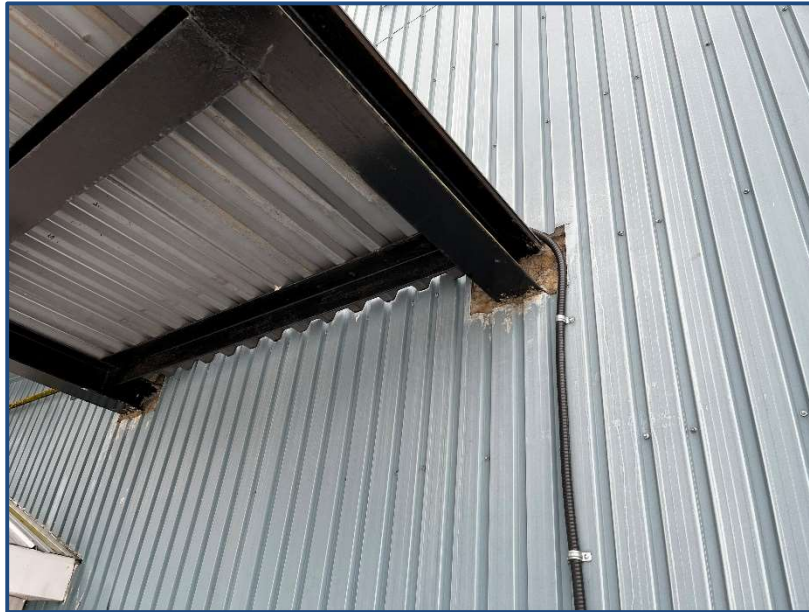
Damaged Eavestrough on First Floor Offices
